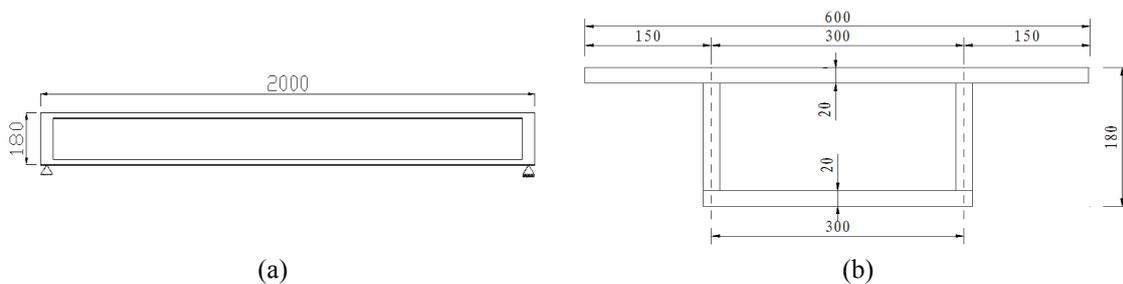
Elevation and sectional view of corrugated steel web composite box beam (Unit: cm)
